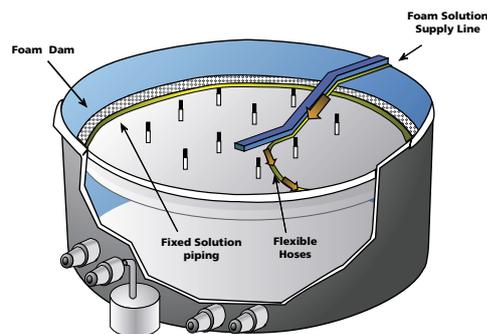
Catenary System Protection of Open Top Floating Roof Tanks
